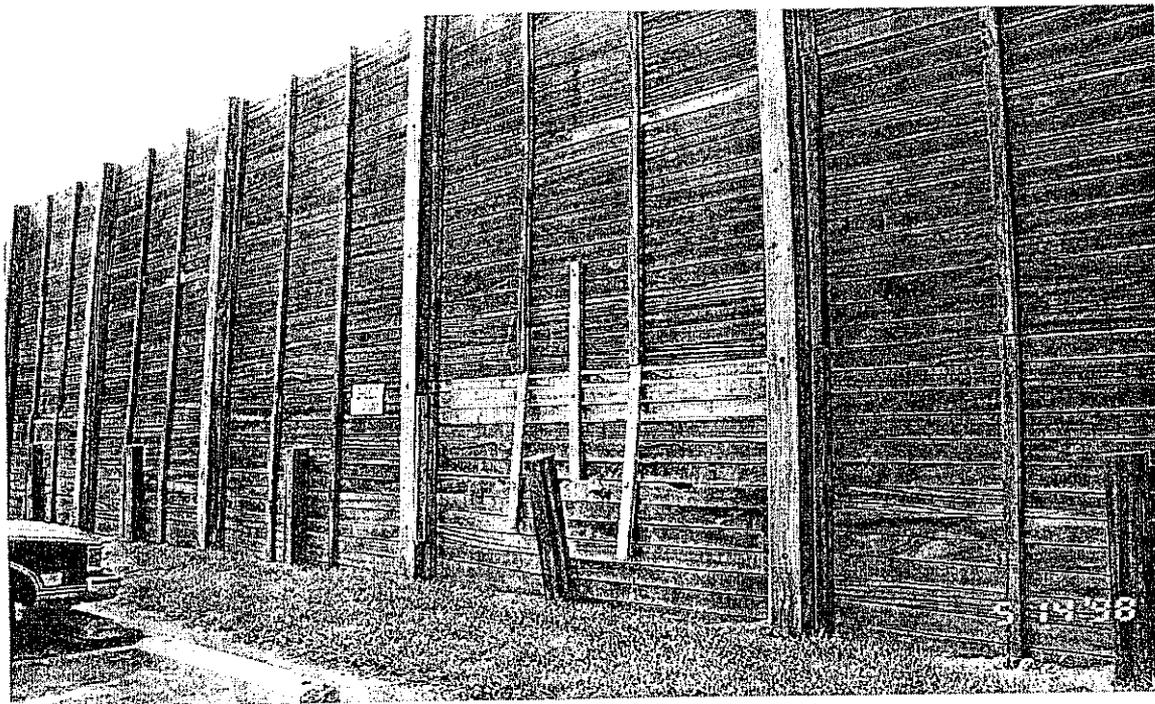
Tropical hardwood barrier, IL 53 at Lake Cook Road.
